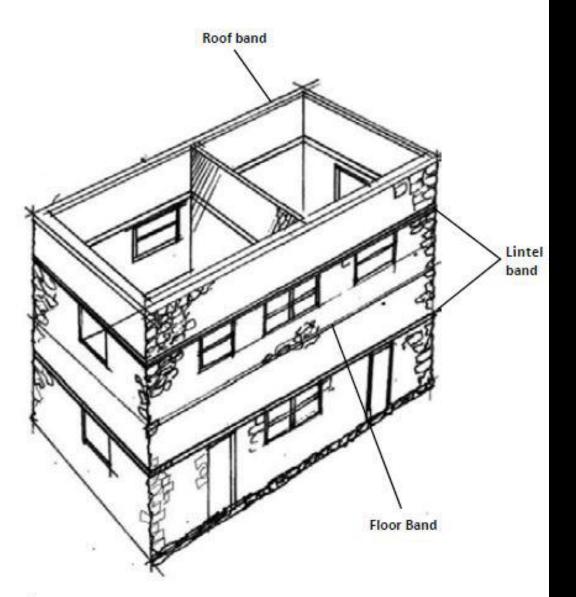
Locations of seismic bands in a stone masonry building (roof omitted for clarity) (adapted from: UNCRD 2003)
